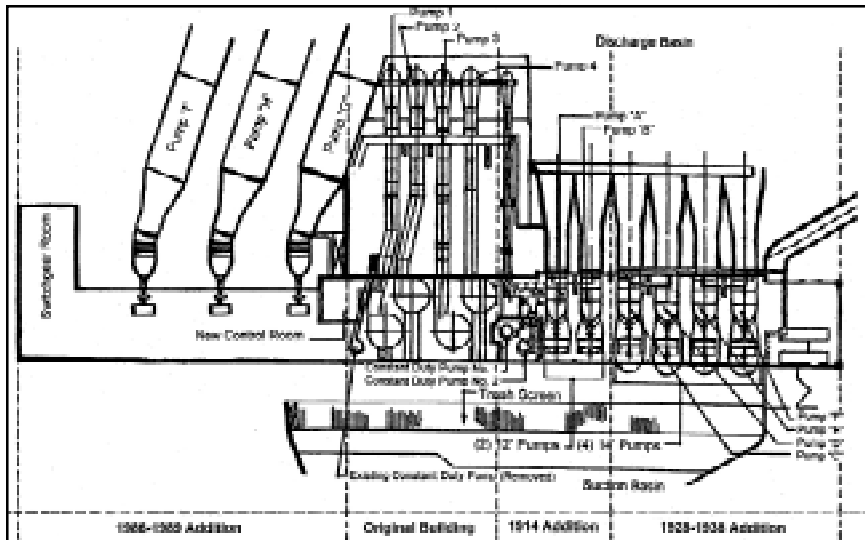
Drainage Pumping Station No. 6. Plan of existing station (NODCOE).
